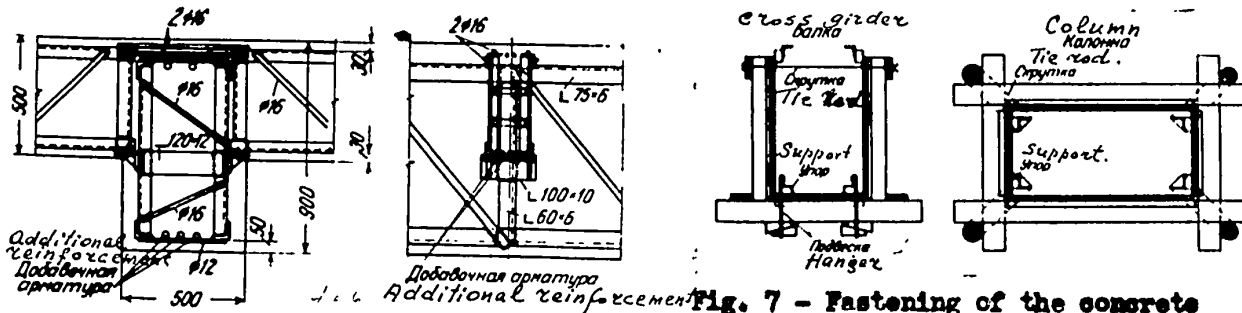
Connection between the steel welded skeleton of a girder and a beam.
